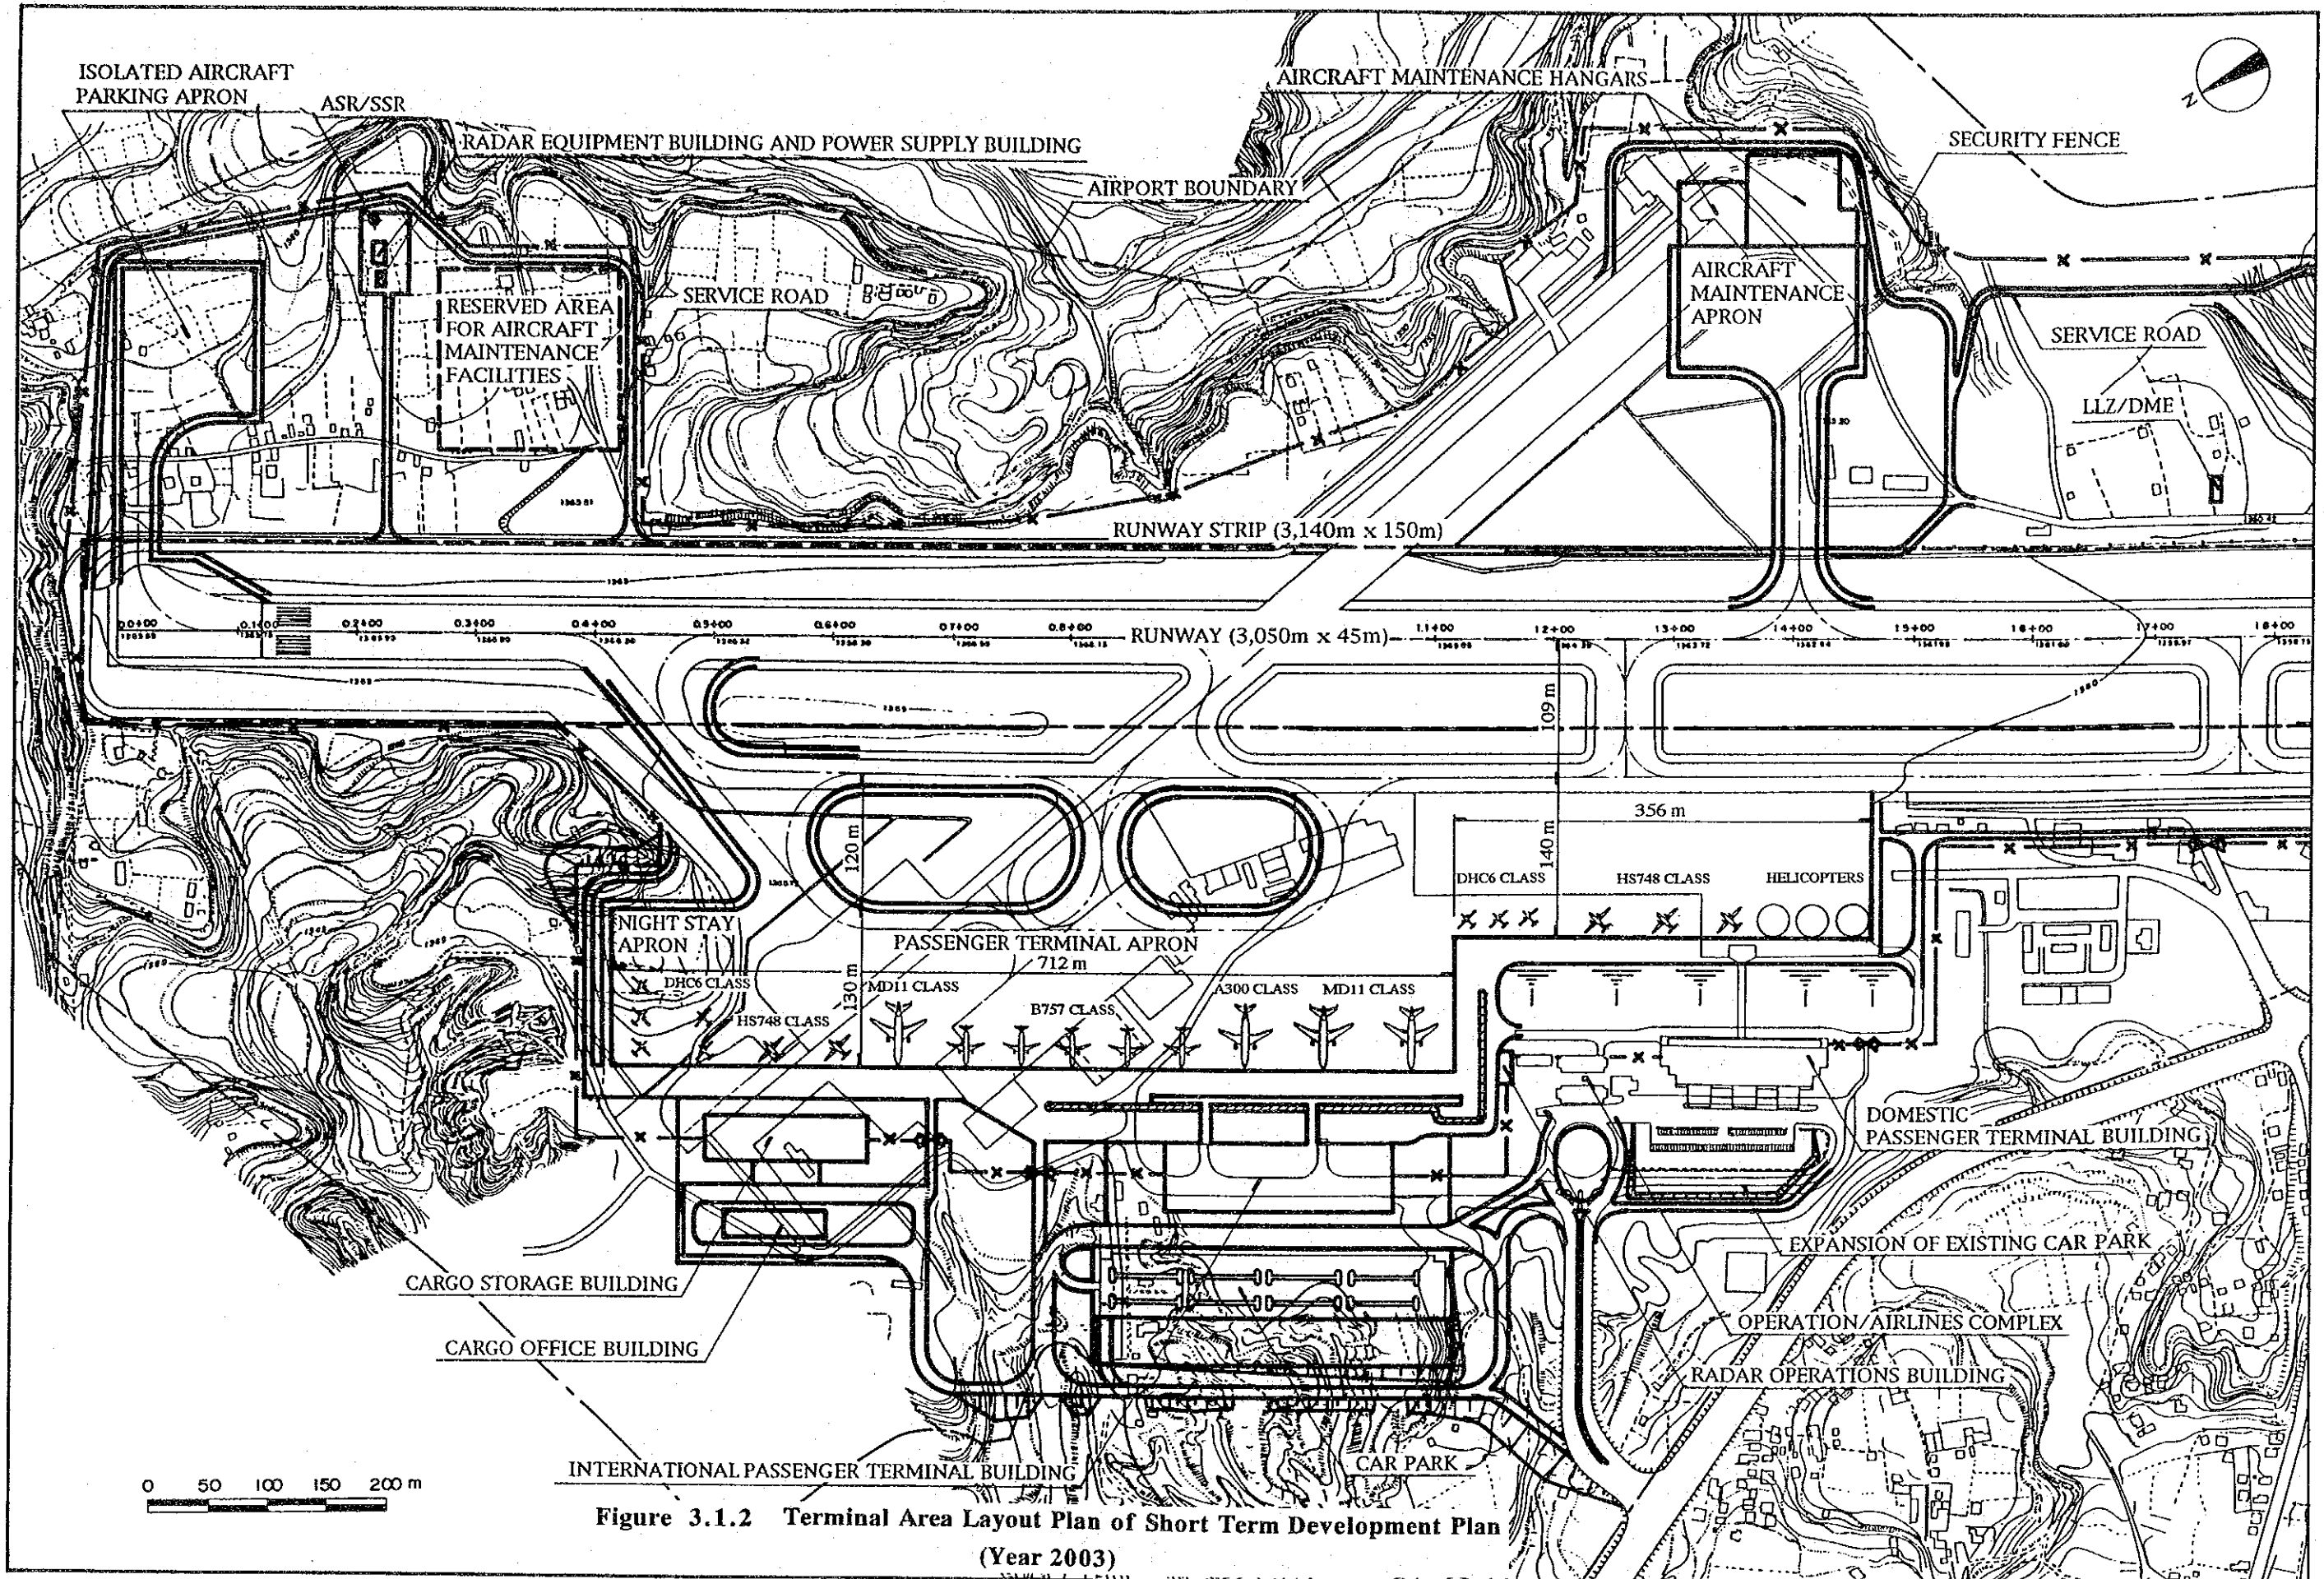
Terminal Area Layout Plan of Short Term Development Plan
